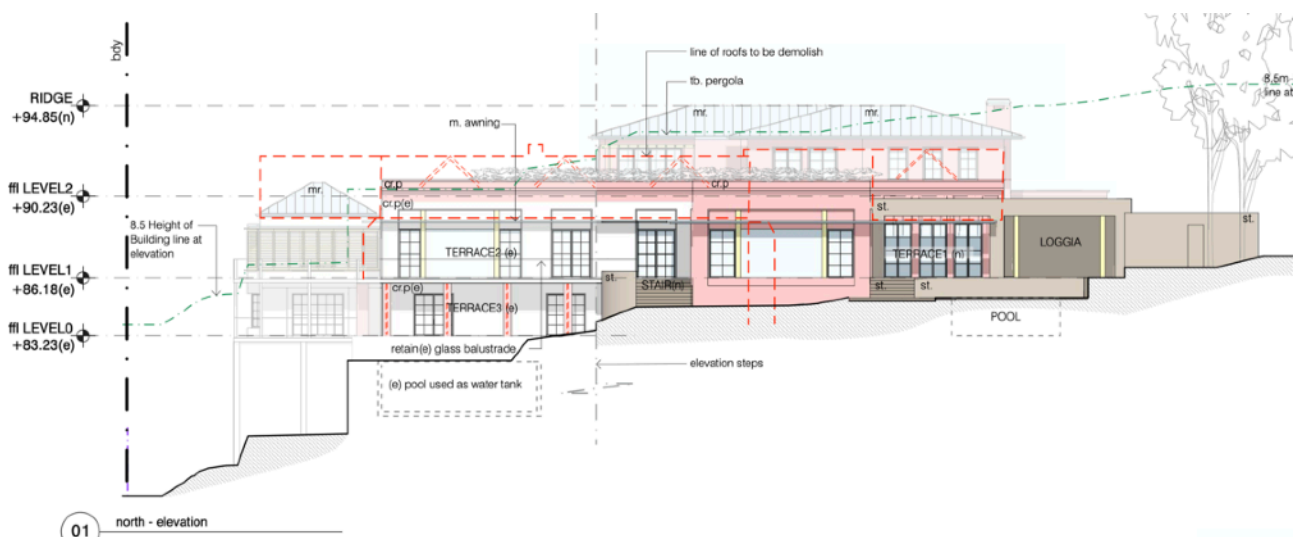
North elevation demonstrates the stepping of the roof forms to limit presentation to two storeys and respond to the sudden level changes to the east and north Source: Campbell Architecture
